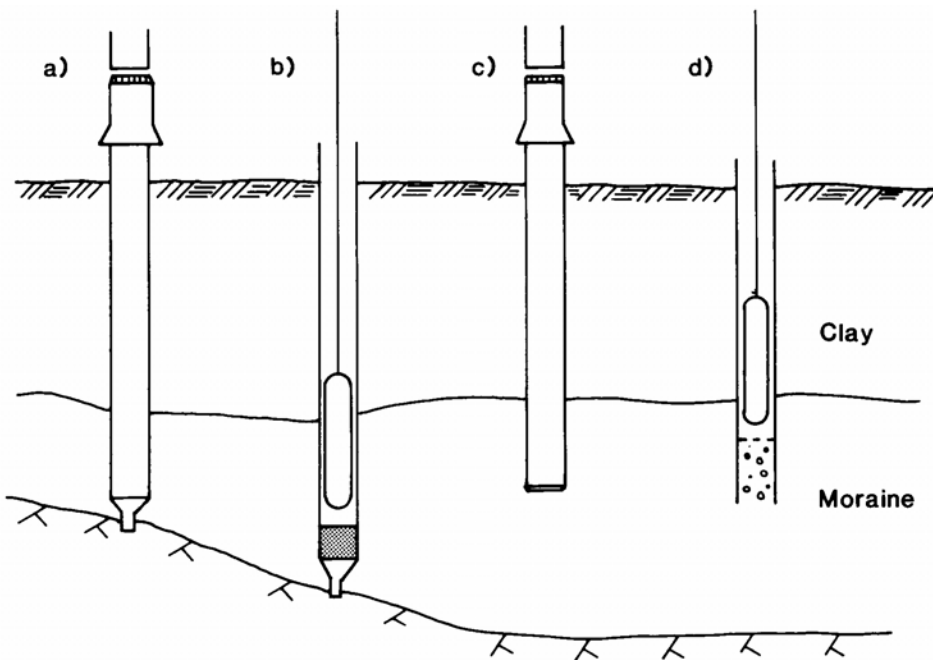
a) Pile equipped with a rock shoe and driven from the top of the pile.
